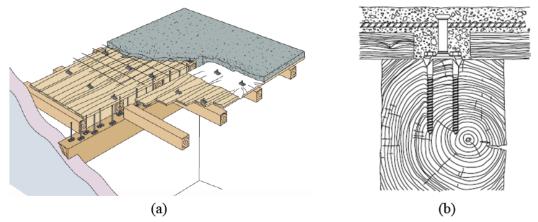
a) Example of the reinforcement of a wooden floor with a cooperating reinforced 'concrete slab, b) Basic connectors Tecnaria
